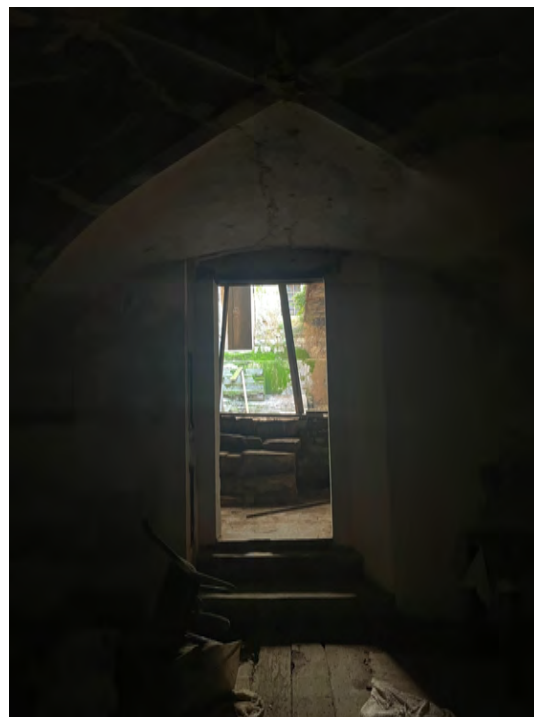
The passageway from Saint Pierre Han's first floor (115) to the old monastery's basement.
